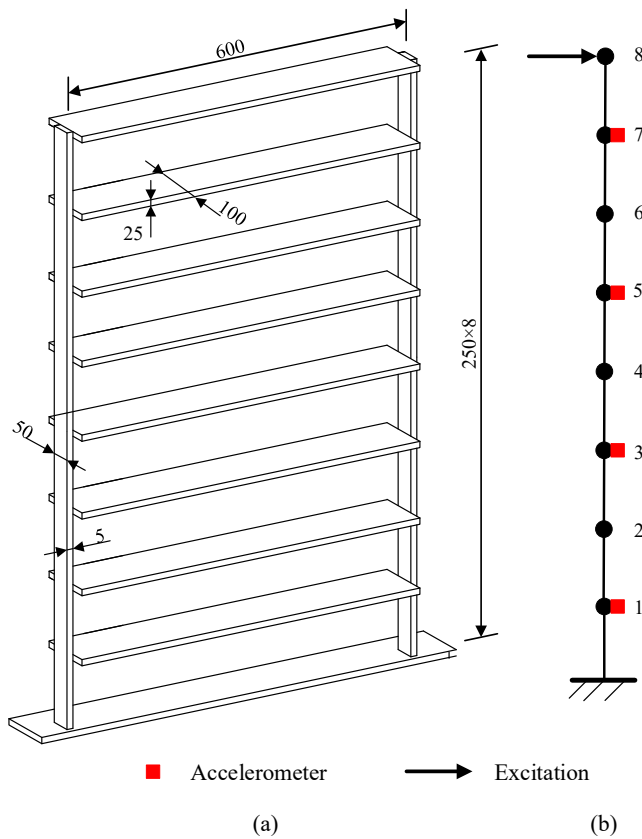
The eight-floor steel frame structure: (a) dimension; (b) finite element model (unit: mm).
